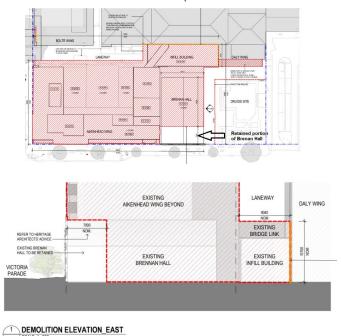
Site plan and east elevation showing the demolition of the Aikenhead building and partial extent of demolition of the Brenan Hall approved under Planning Permit PLN20/0567.
